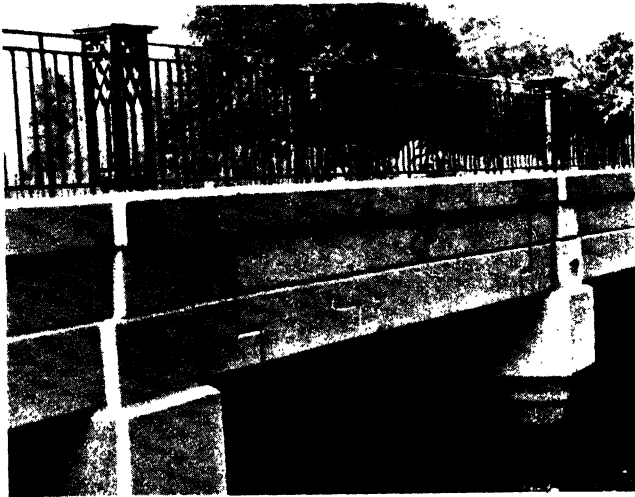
LINDFIELD BRIDGE, SHOWING ENLARGED PILE CAPS, JOINTS, AND RAILING.
